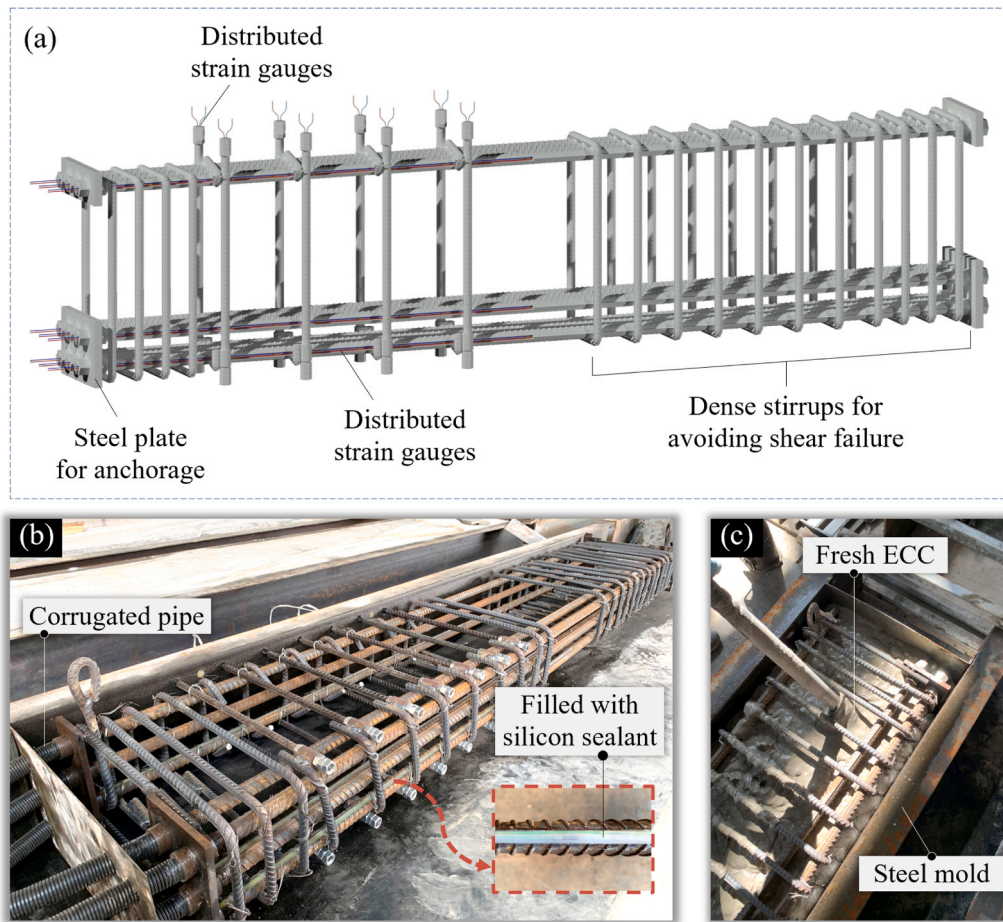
Beam fabrication: (a) detailed view of the steel reinforcement cage; (b) cavity filled with silicon sealant; (c) ECC casting.
